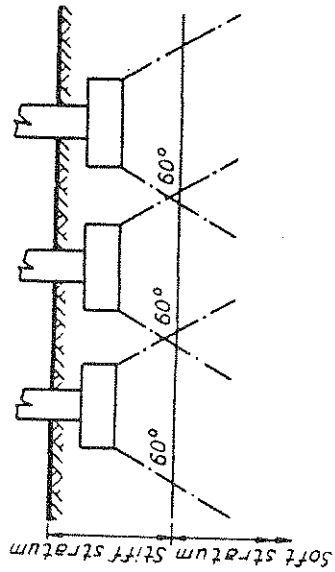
CLOSE-SPACED FOUNDATIONS
